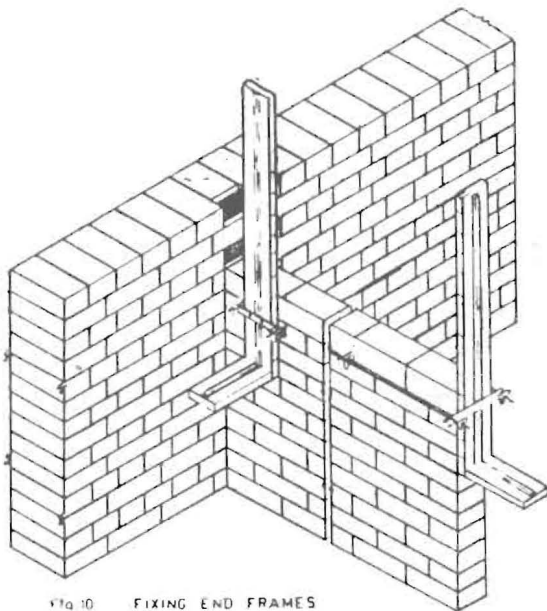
FIXING END FRAMES FOR BUILDING THE CROSS WALLS
